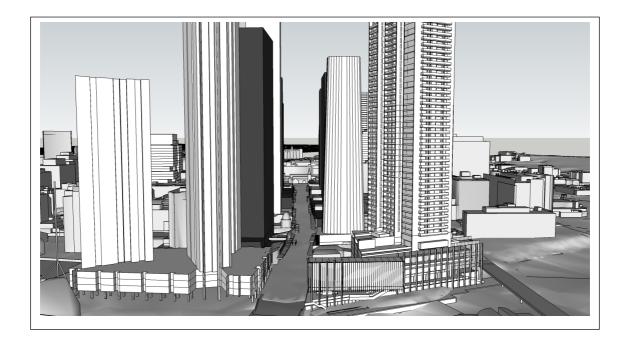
12m upper level (tower) setback - looking south towards St Johns Church
